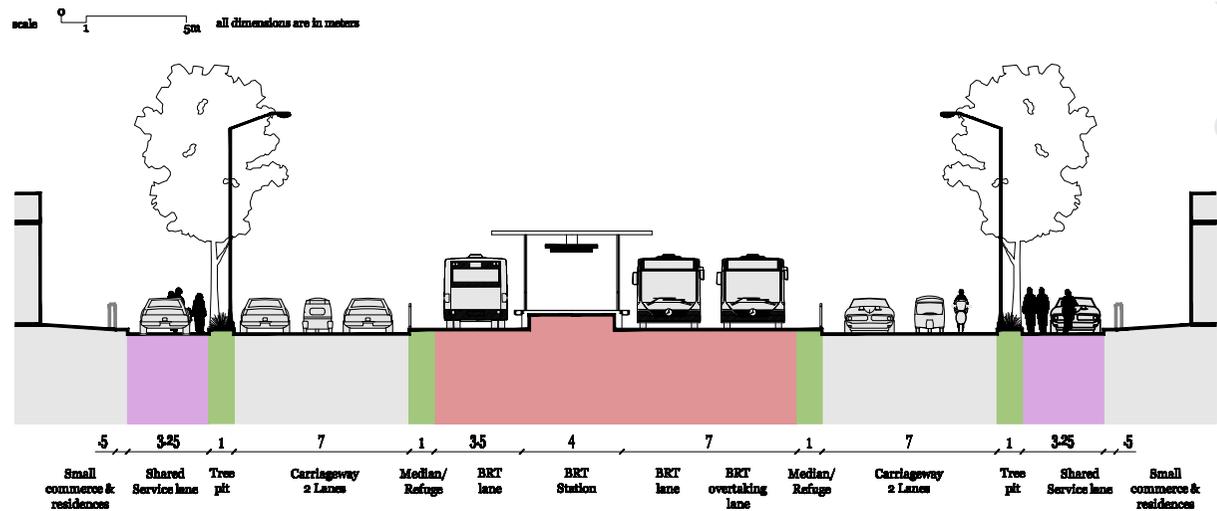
Section through BRT station for typical design for BRT corridors with 40 M ROW
